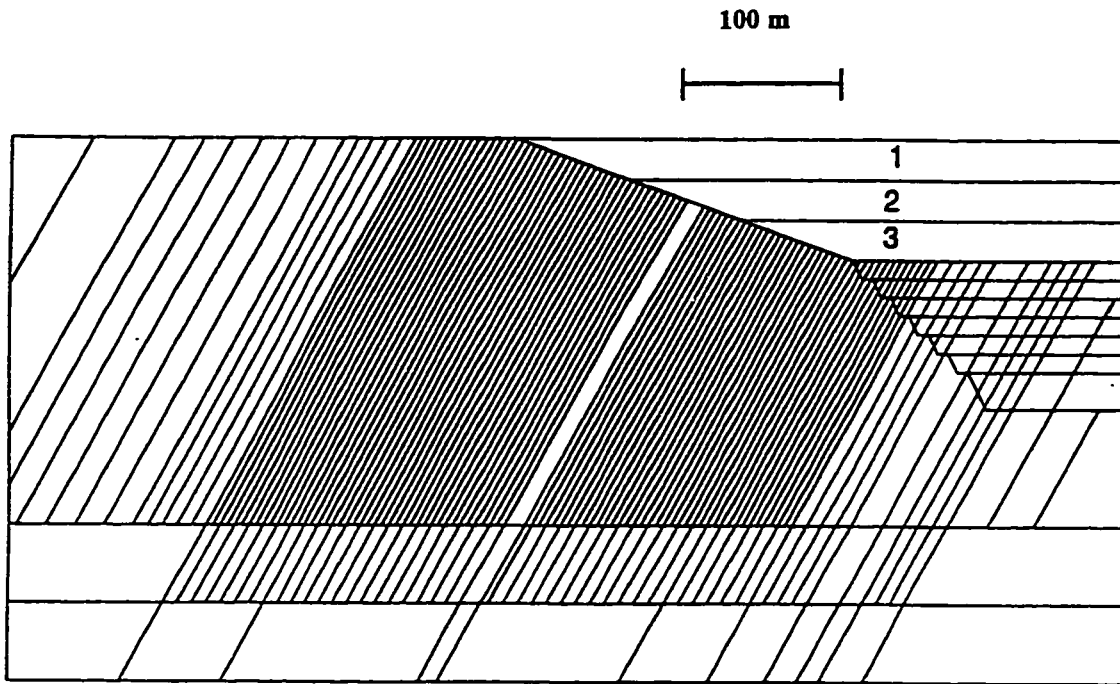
Failure extent in section C20+00 at mining elevation 1804 m and 1768 m, after Bucek and Barron (1994).
